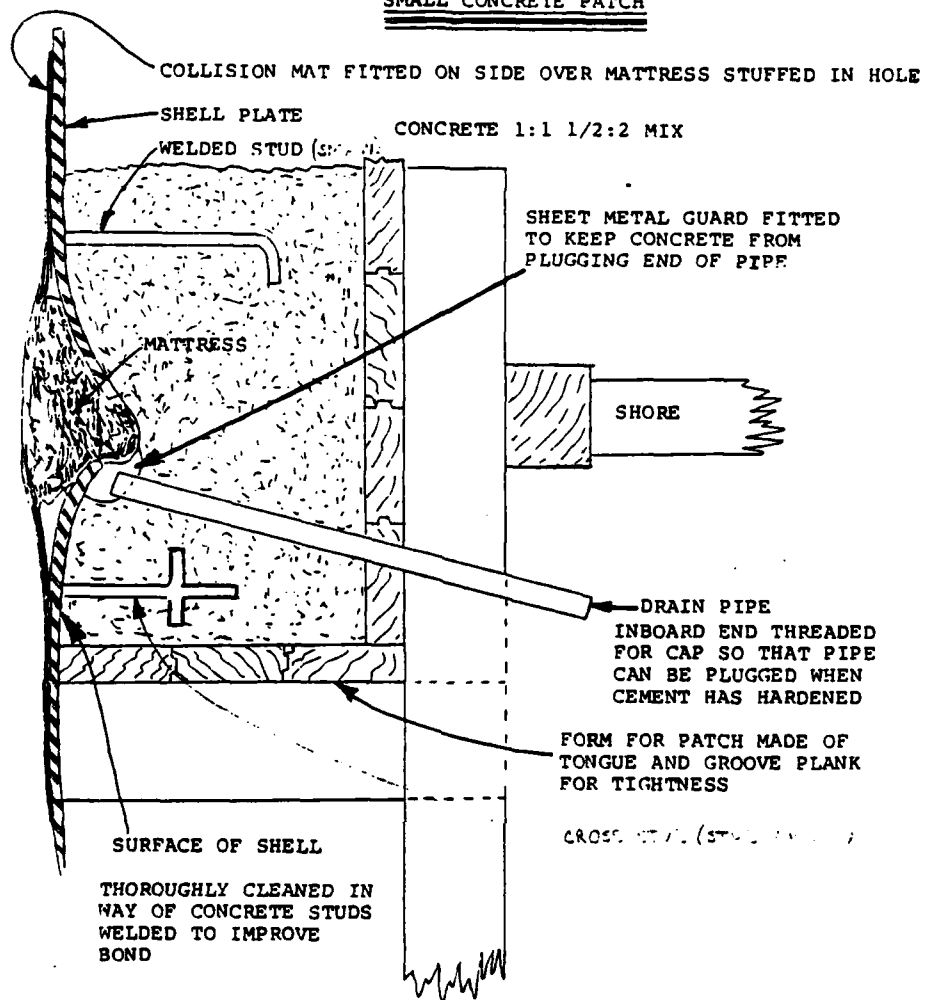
STUD WELDED CROSS STUD & A CONCRETE PATCH [13]
